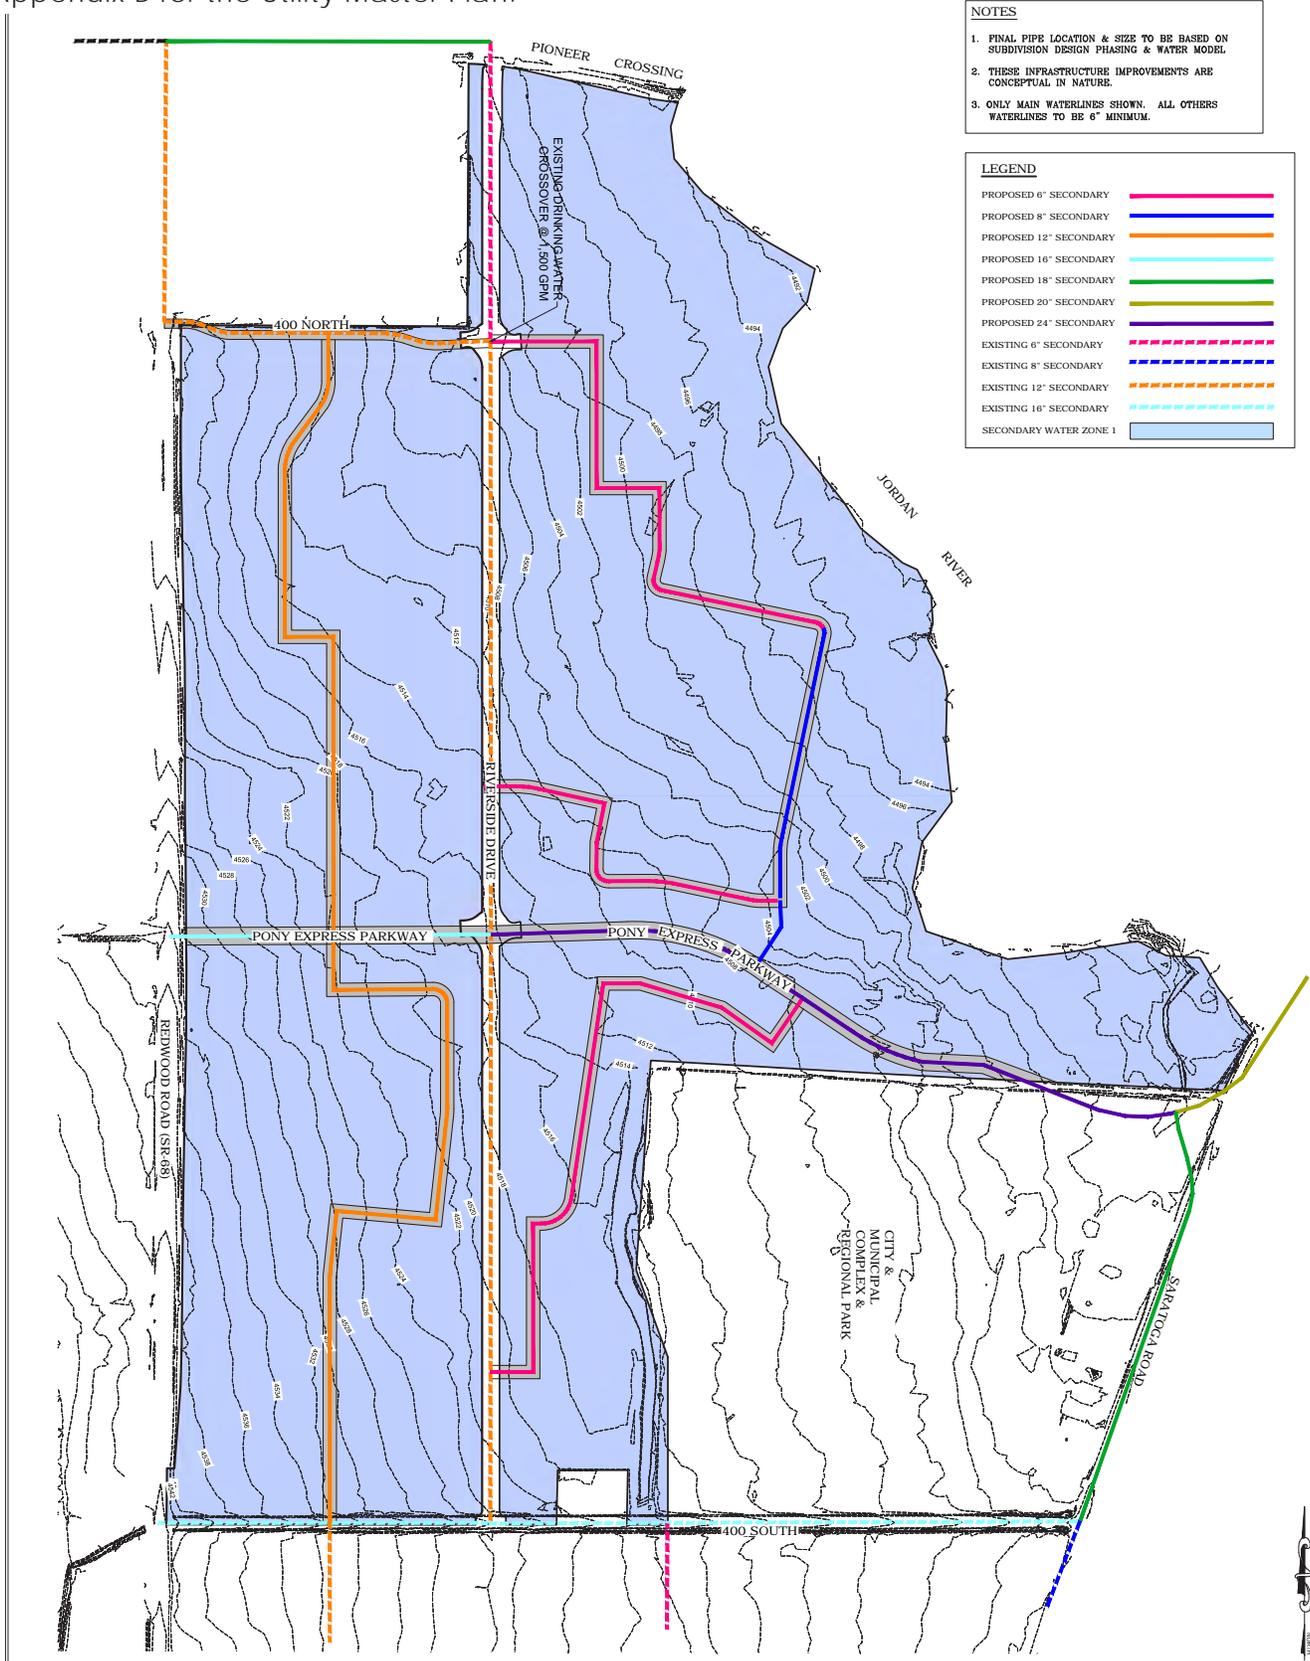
SECONDARY WATER MASTER PLAN
